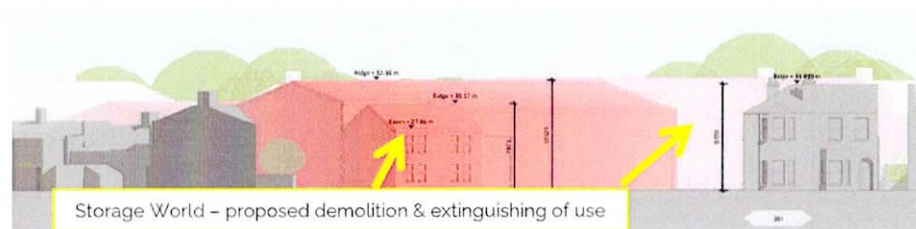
Excerpt from Applicant's proposed demolition elevations (1)
